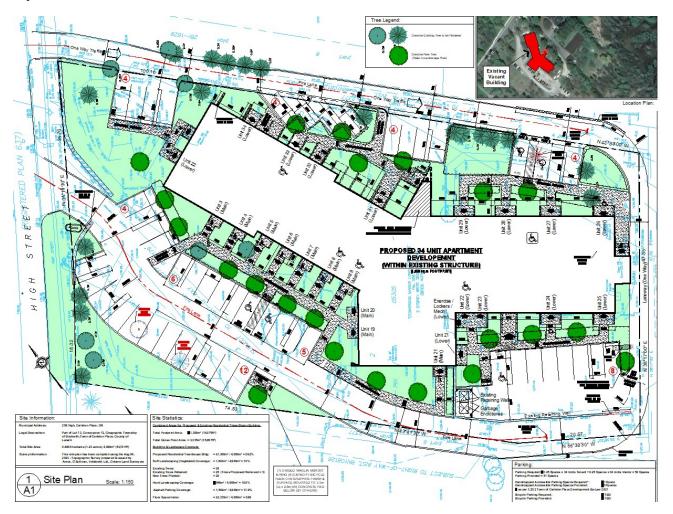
Site Plan showing Communal Greenspace and Pedestrian Linkages
